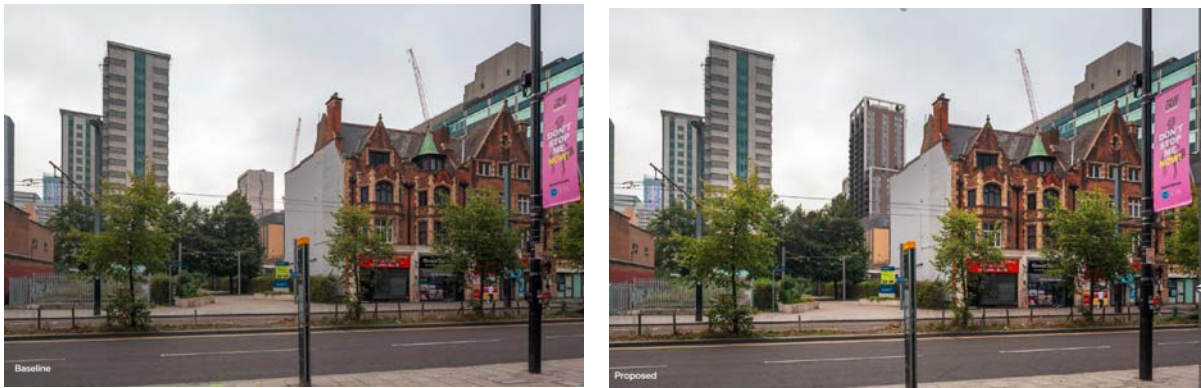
Existing and proposed visualisation from southern pavement of George Street, at Collage Square facing north
